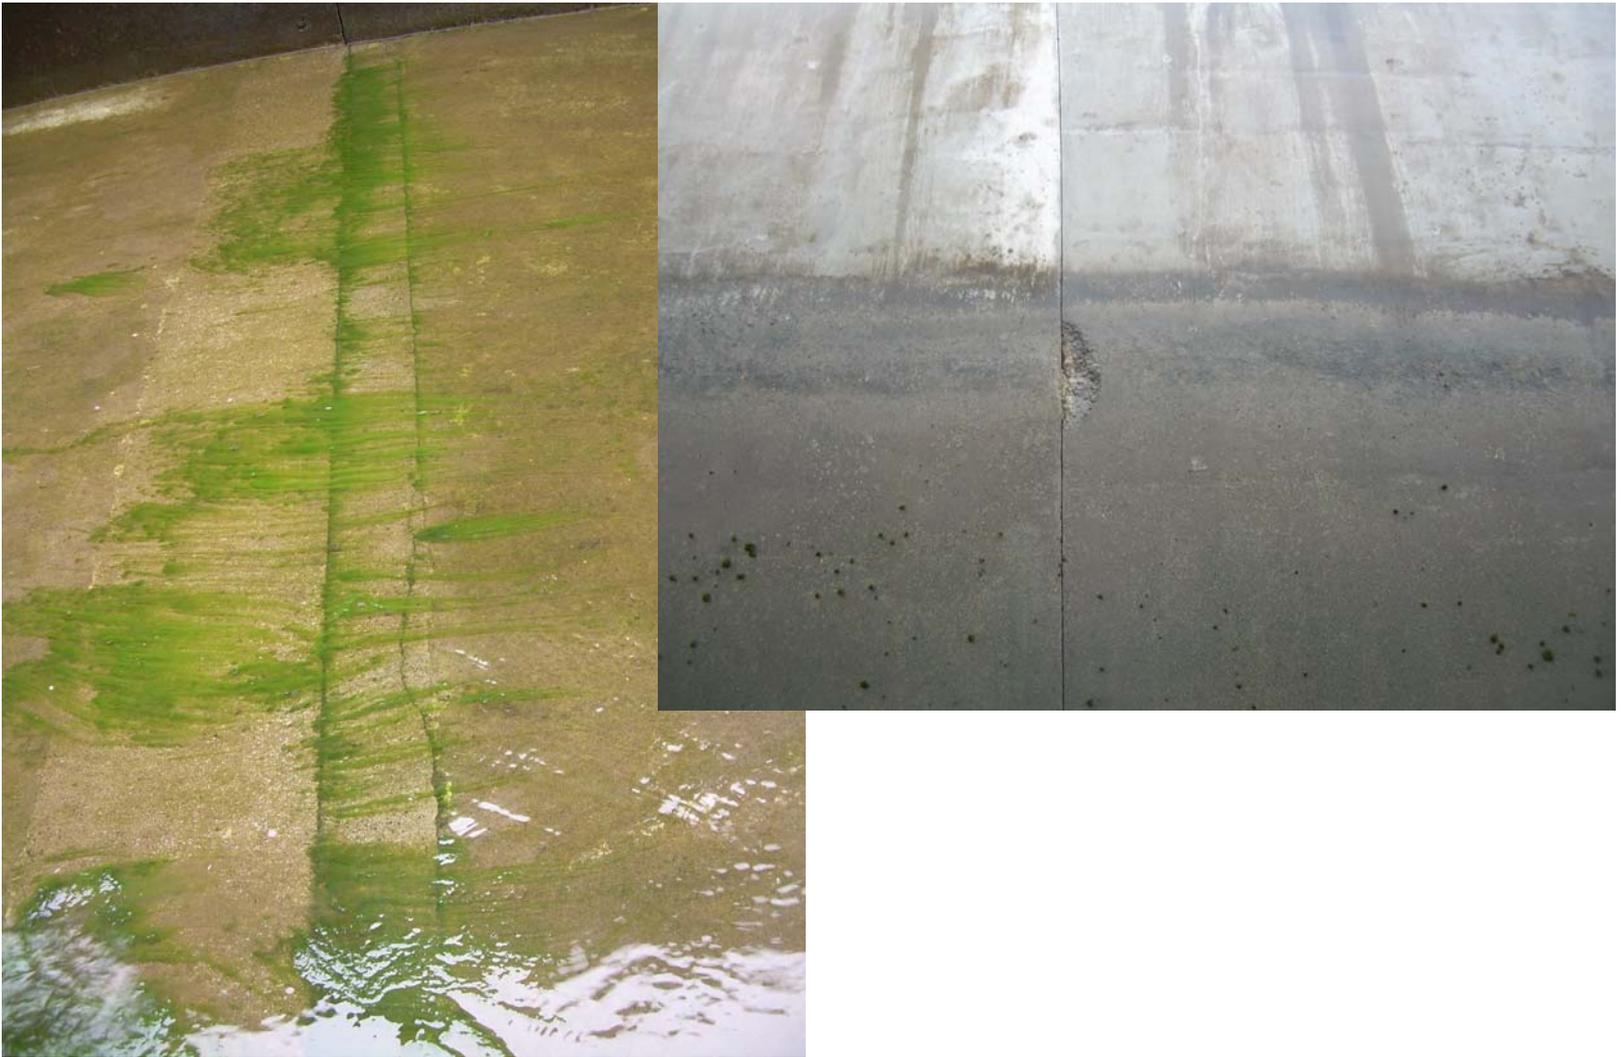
Sta 24+86 iover crack, spall 18” by 6” located 14’ up on wall
